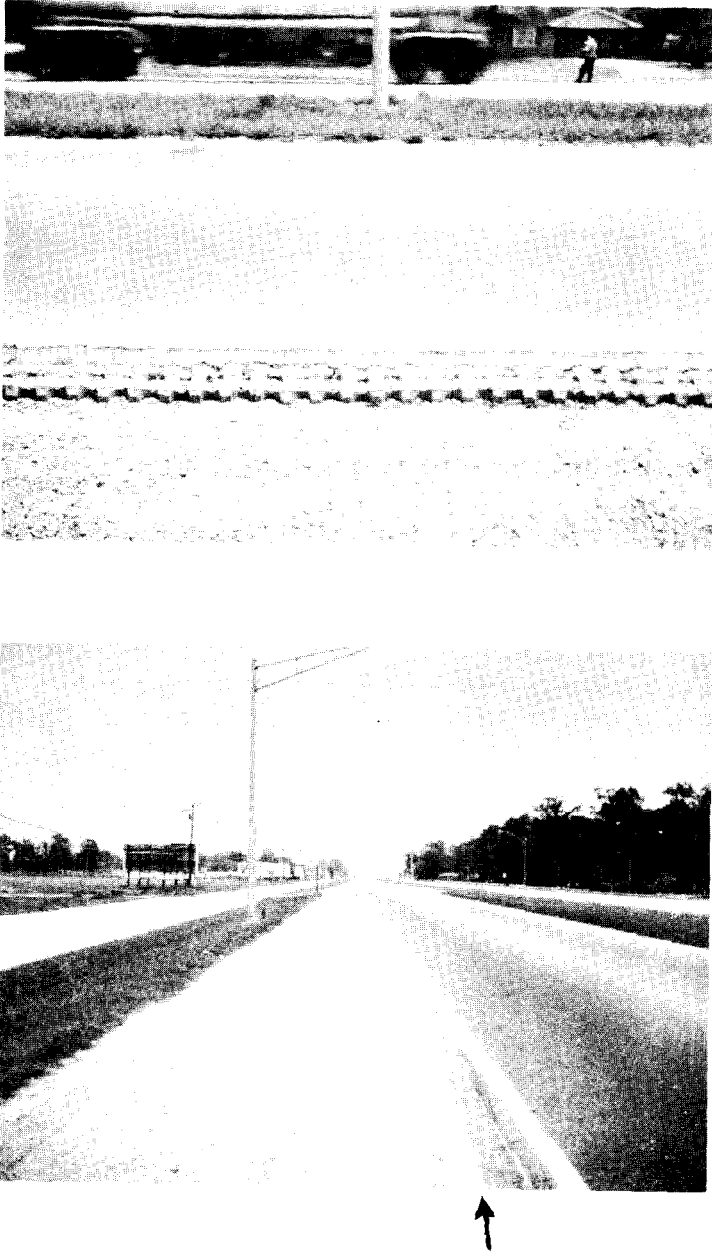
Cellular Concrete Blocks Used to Prevent Rutting of Pavement Edge Subjected to Continuous Dual Wheel Traffic. This installation is too narrow for the intended purpose, at least two additional rows are required. The rough surface serves as a rumble strip to warn the driver in time to recover. Additional testing is required for use such as this.
